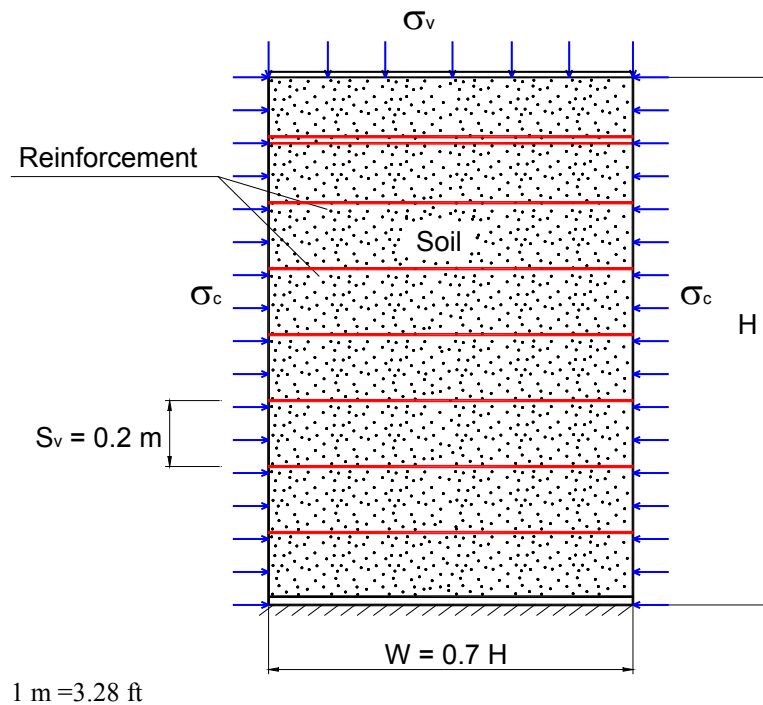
Illustration. Typical geometric and loading conditions of a GSGC.
